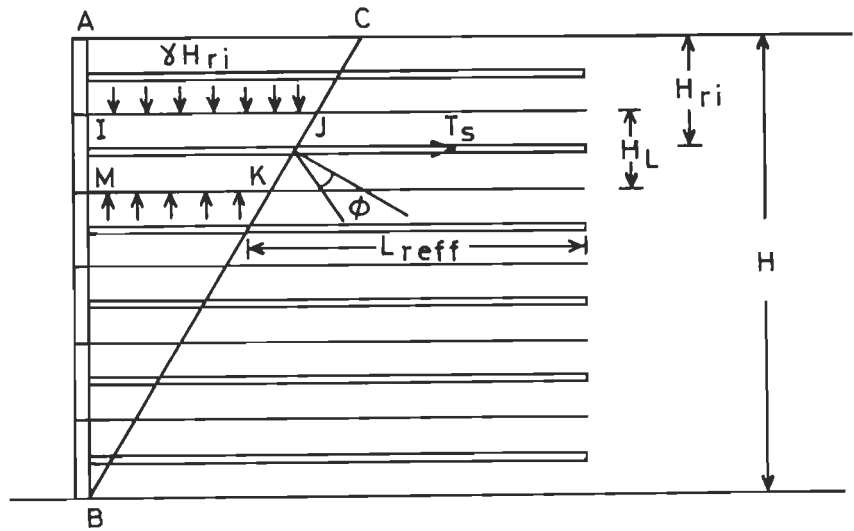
FORCES ACTING ON HORIZONTAL ELEMENT OF R.E. EMBANKMENT.
